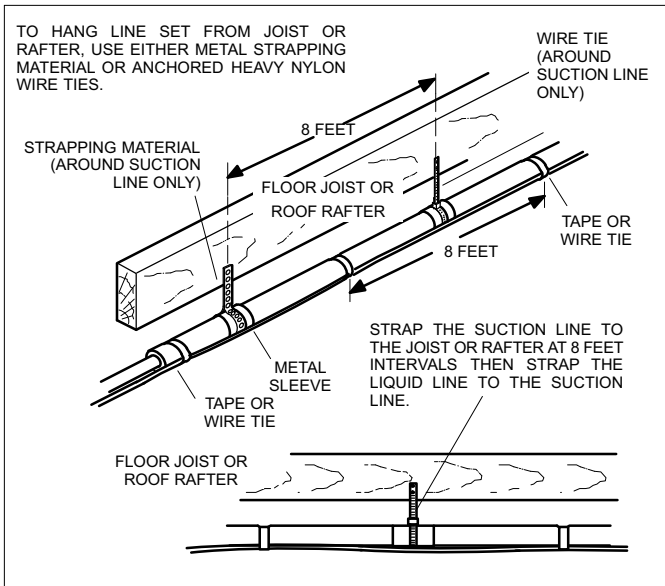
Refrigerant Line Set: Installing Horizontal Runs
